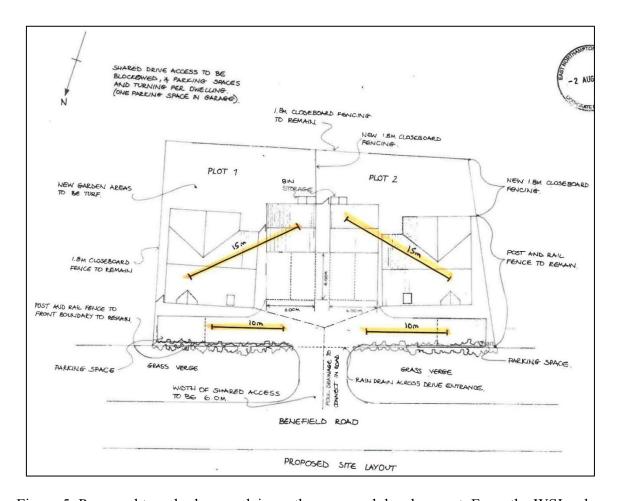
Proposed trench plan overlain on the proposed development. From the WSI - plan provided by client. (Note - North arrow slightly misaligned).
